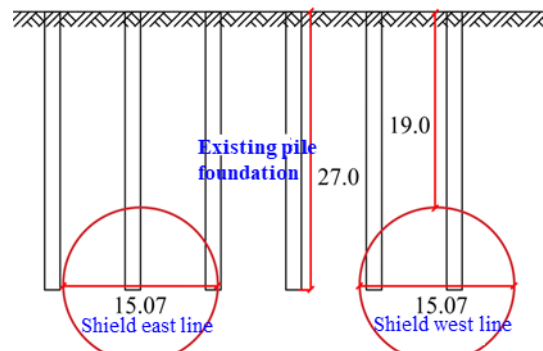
Engineering diagram of Haizhu Wan Tunnel shield section
